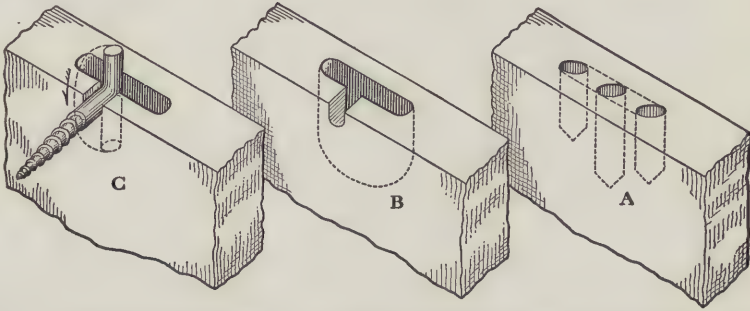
WAINSCOT, WALL SLAB AND MIRROR FRAME TOP ANCHORS—PROCESS OF FITTING
